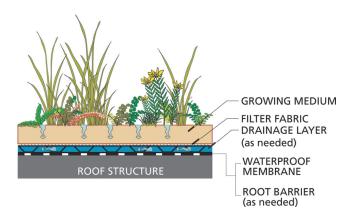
(D) Eco-roofs are an extensive green roof system. These roofs typically are constructed with layers of waterproof membrane, drainage material, and a lightweight soil and planted with shallow-root plant material. This application is appropriate for conventional roofs that are flat or low-sloped. (*Source:* City of Portland, Oregon)
